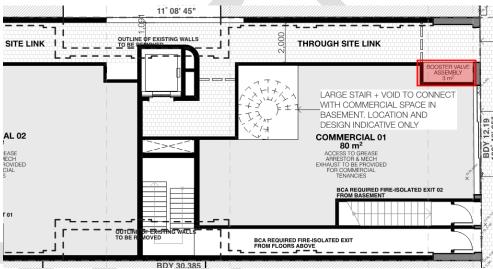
(b) – Hydrant booster is not permitted to be located within the building
